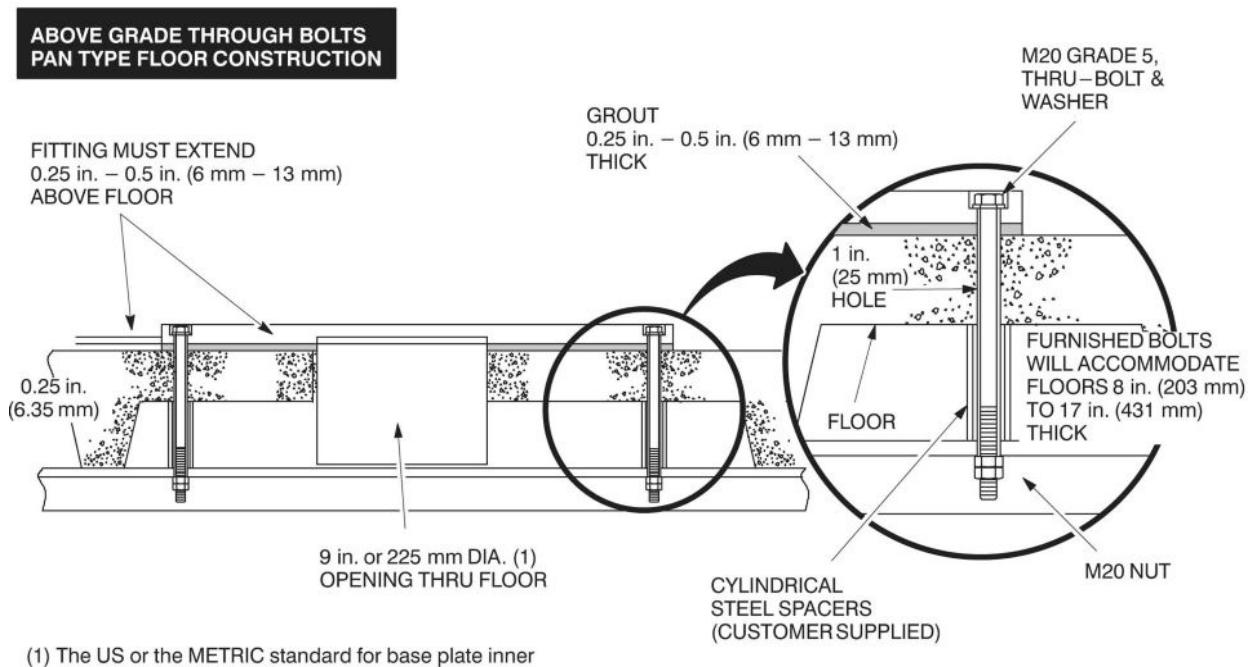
Inner Base Plate For Above Grade Floor Anchor Kit
